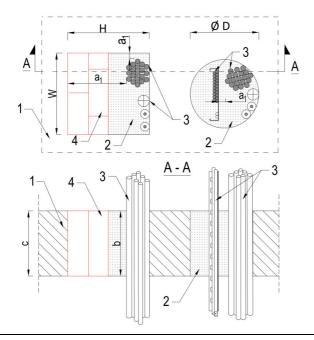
Cable penetration seal in floor - detail with increased floor thickness
